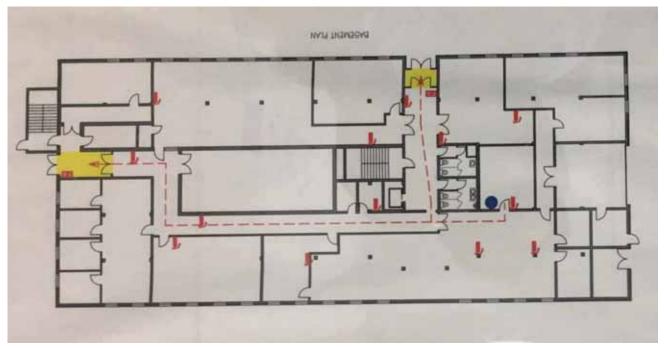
Basement (walk-out) floor plan from building-posted egress map (N.T.S.)
